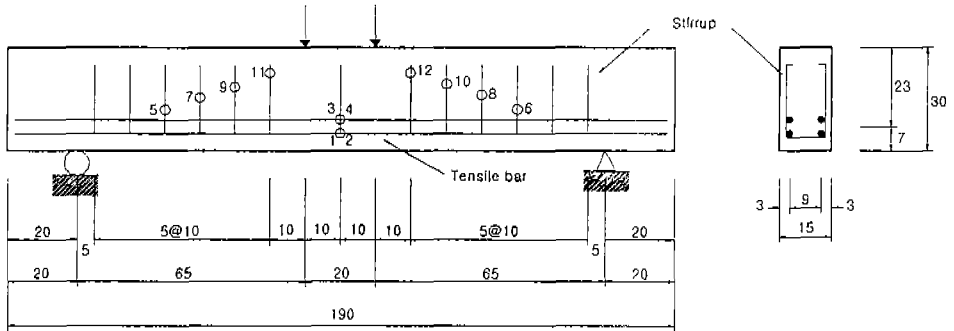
Cross-section of fatigue test beams and loading arrangement(unit : cm)
